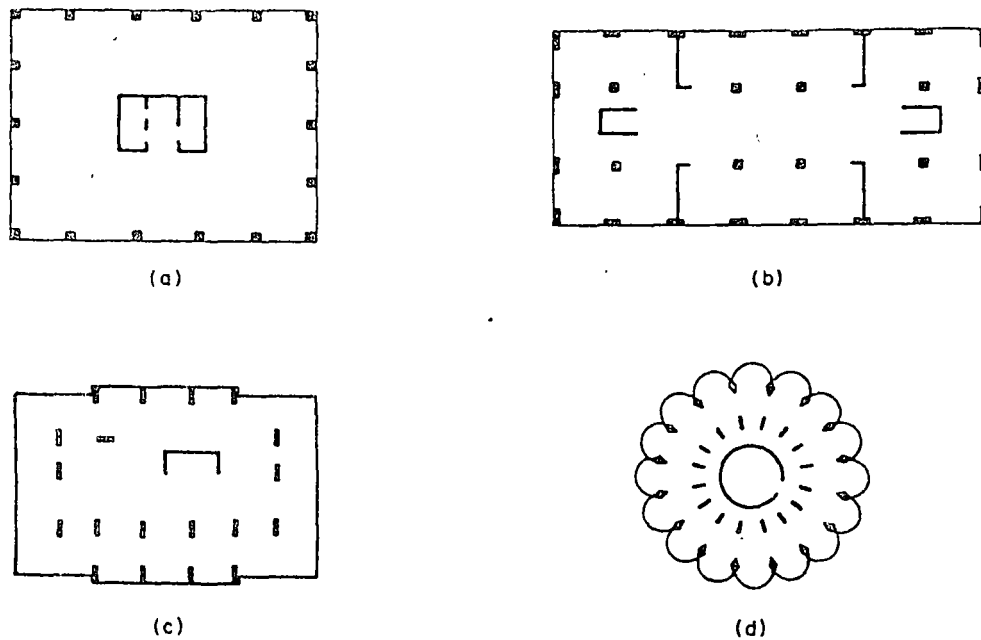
Typical layouts of high-rise buildings with shear wall-frame interaction
